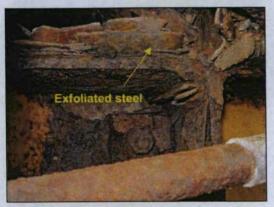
Intermediate moment frame connection at Location 4 with exfoliated steel at top of beam.
